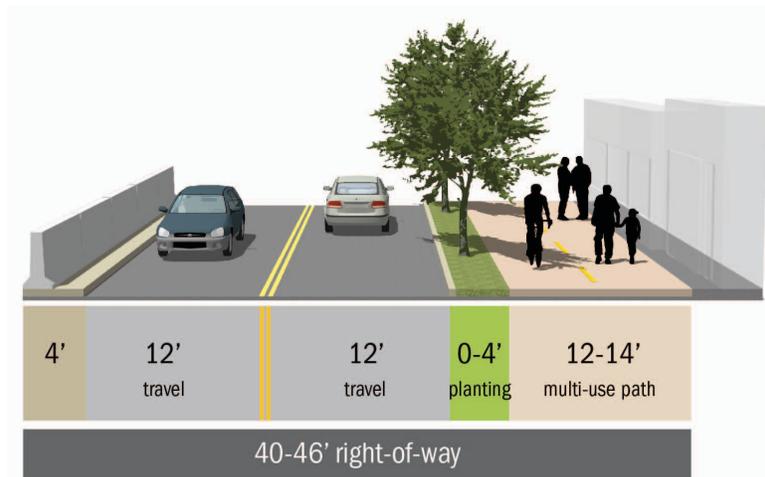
Conceptual Cross-Section for Main Street – South of Milport Road within existing right-of-way
